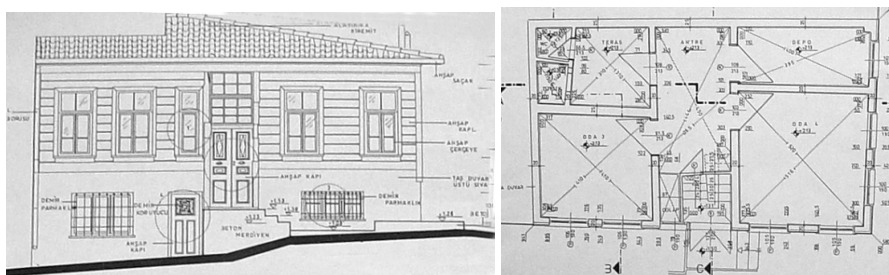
Raif Kurteler Front Elevation and First Floor Plan
